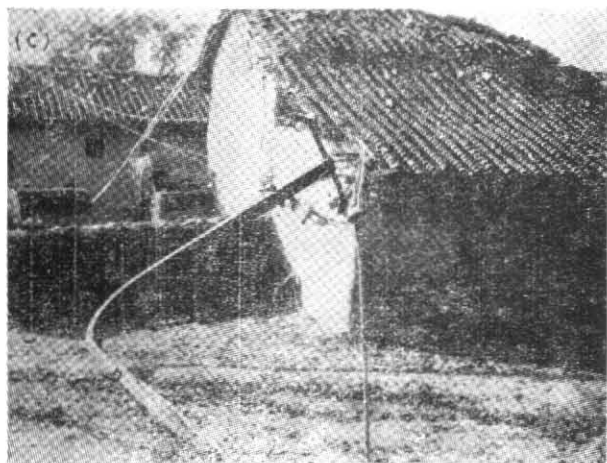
(c). An electric pole bent, tiles of adjacent house broken in Ariyaon village
